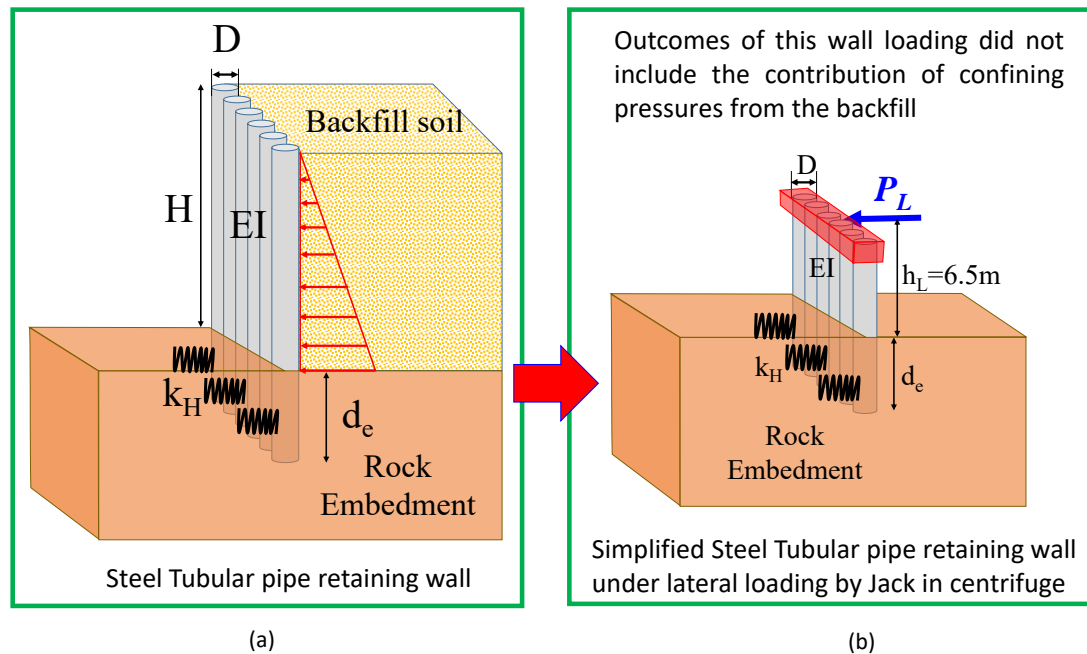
(a) Target structure and (b) simplified loading on steel tubular pile wall
